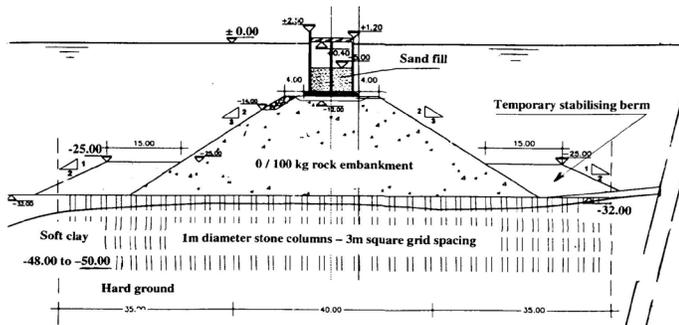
Typical breakwater section in the Harbour of Patras, adapted from Debats and Degen (2001)
